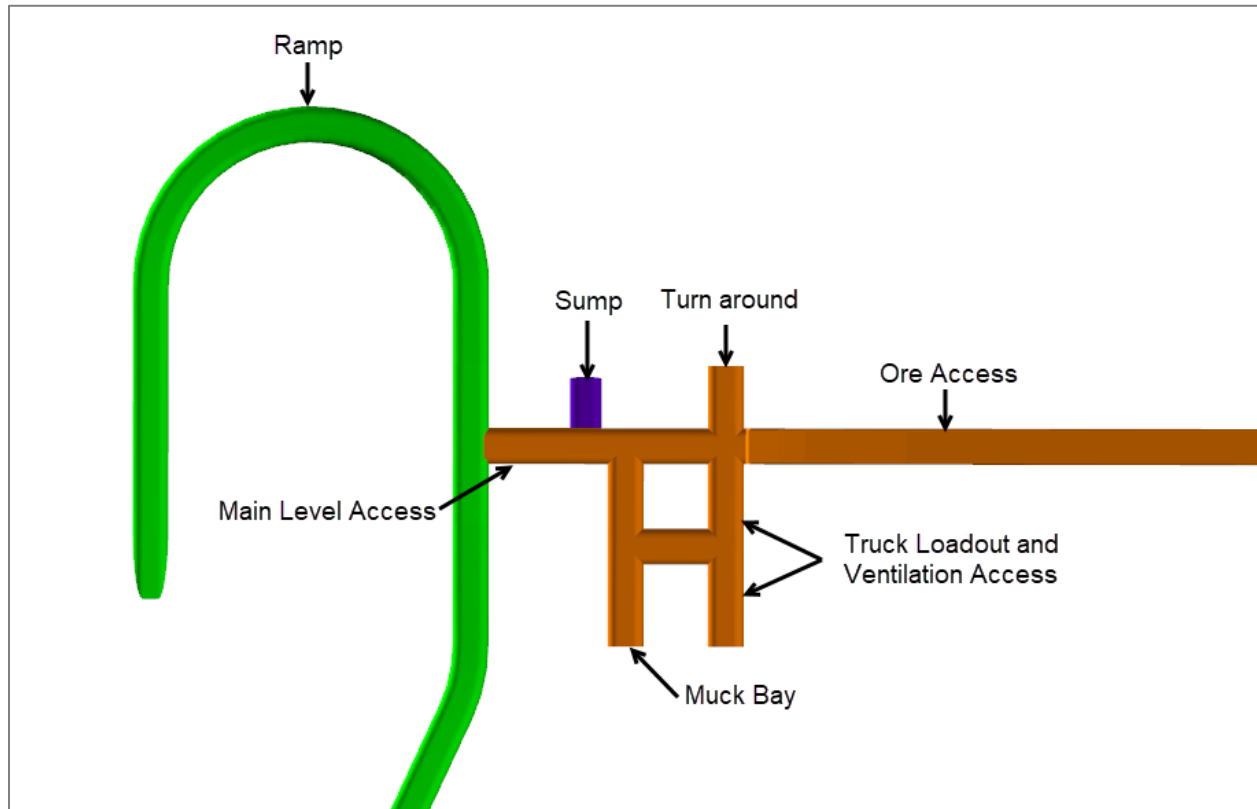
EC120 TYPICAL LEVEL ACCESS DESIGN
